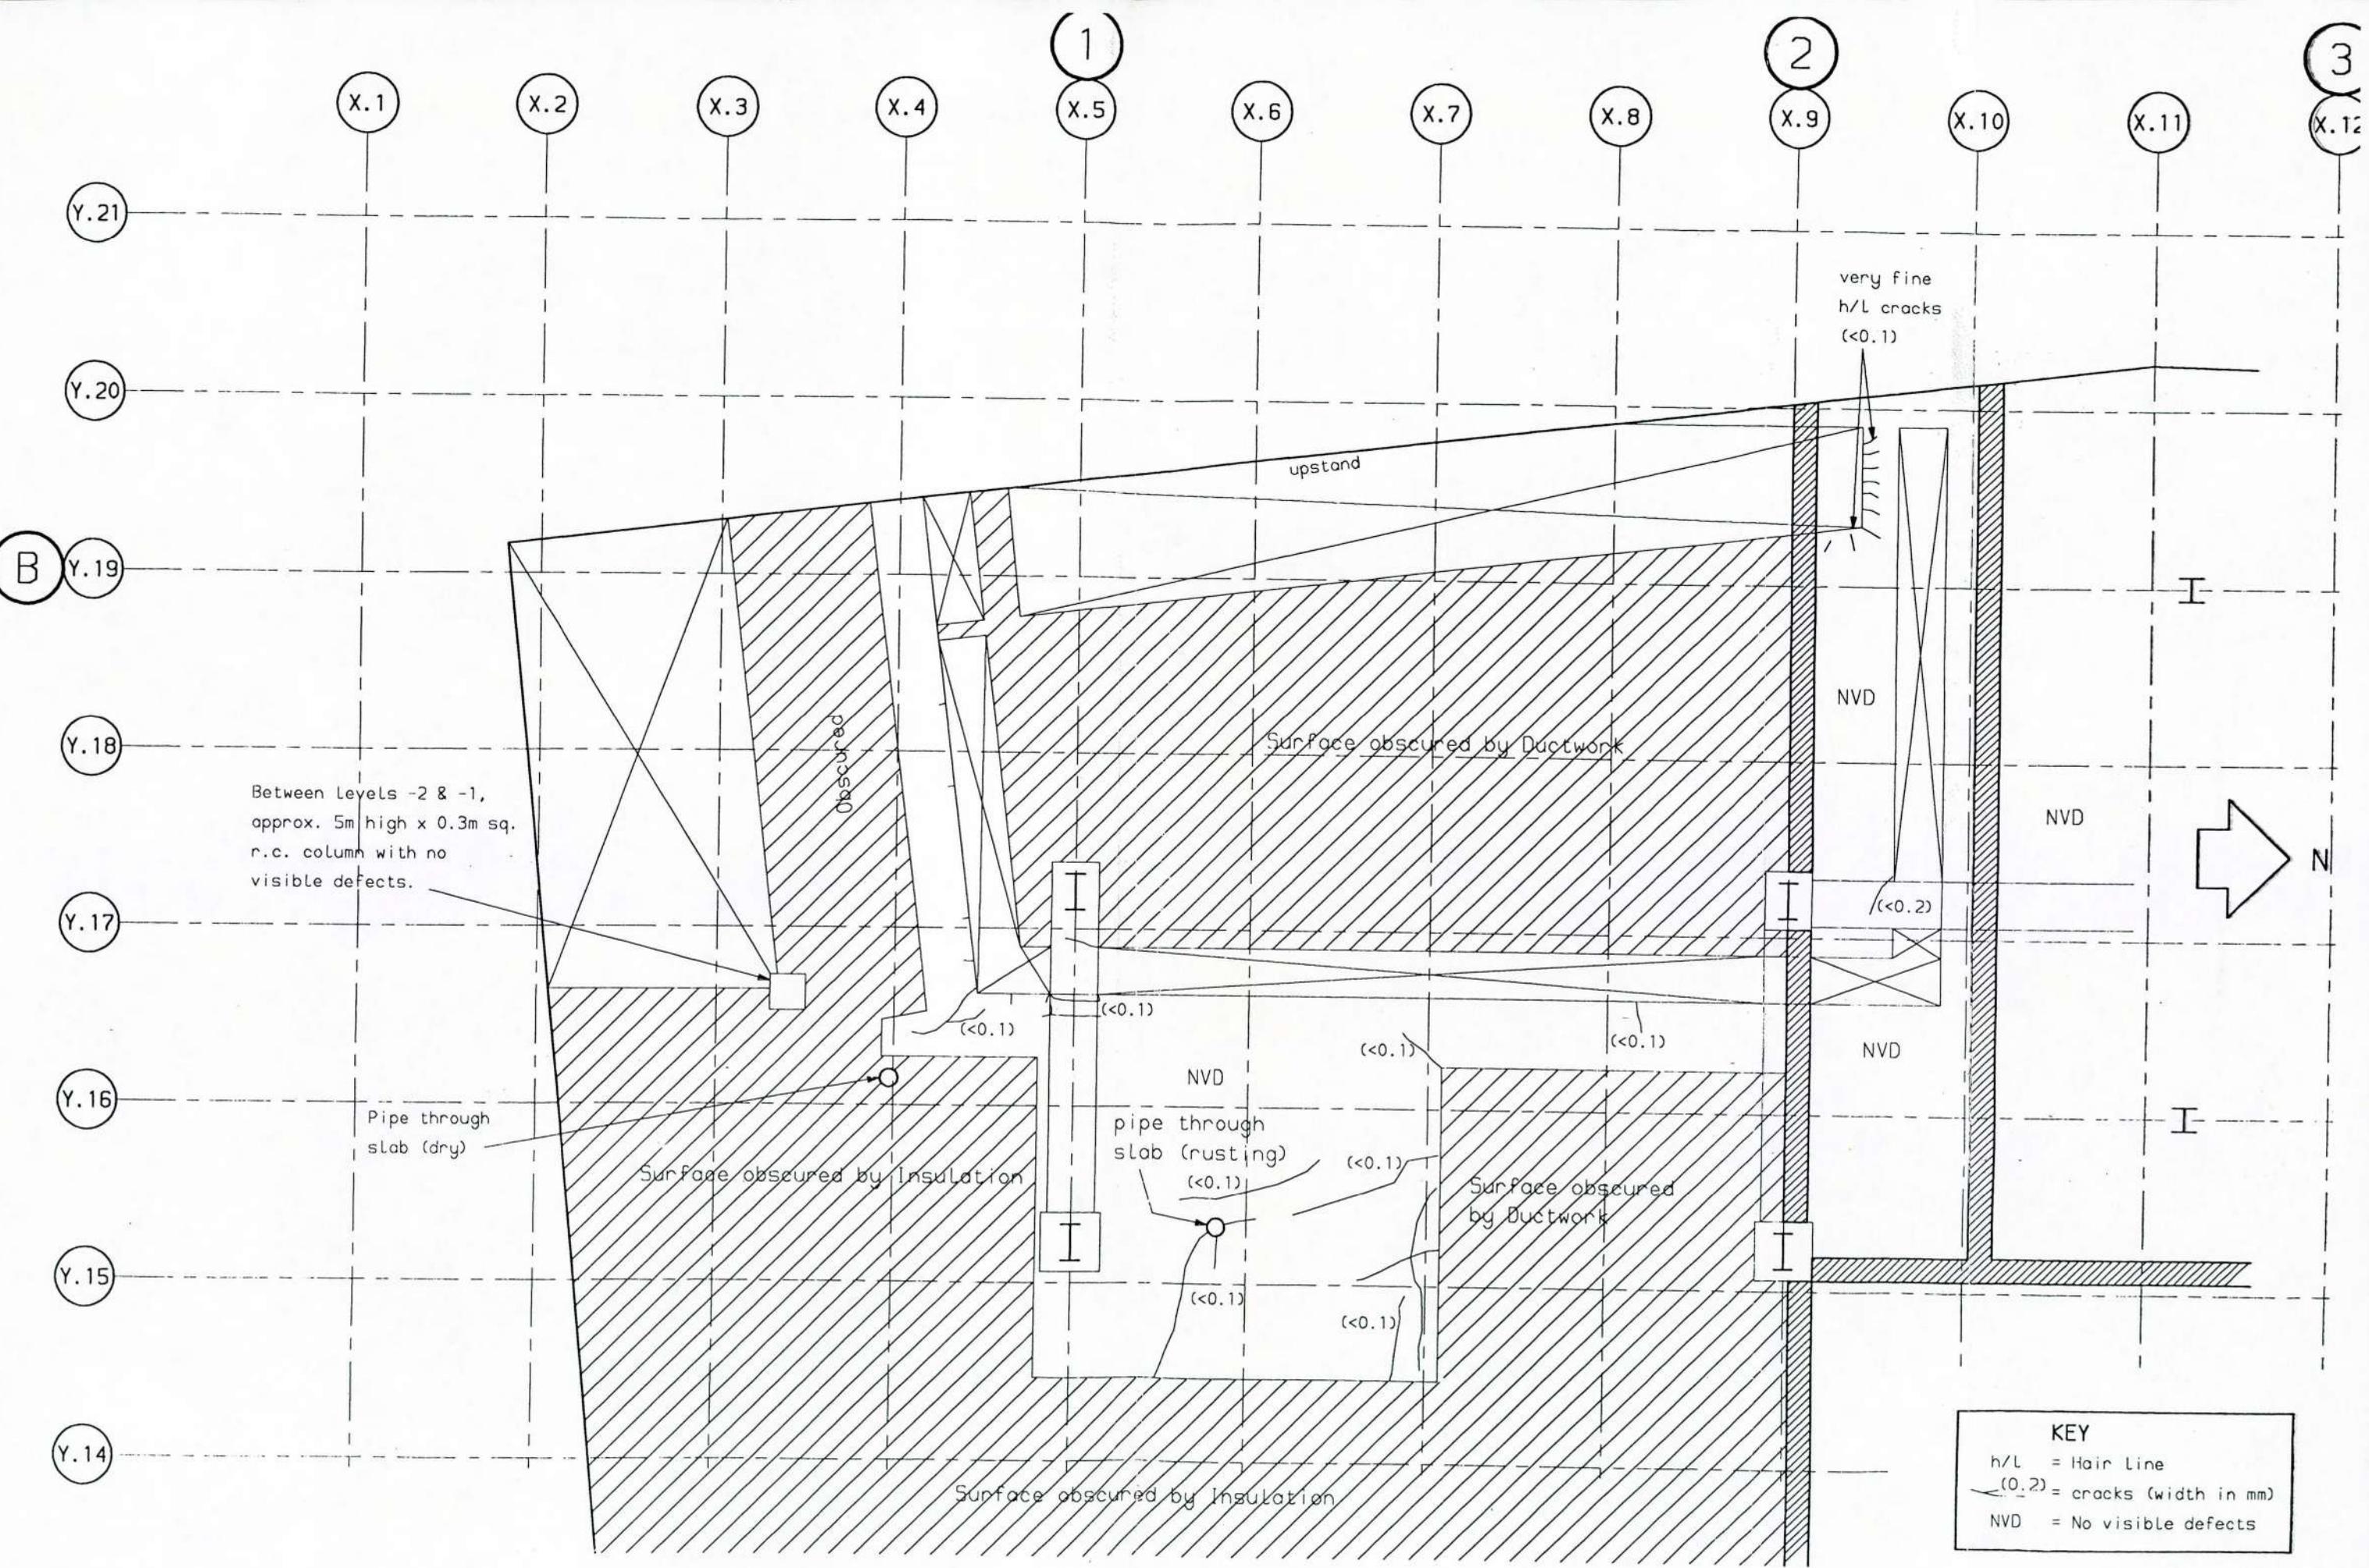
LEVEL -1 SLAB, SOFFIT INSPECTION
